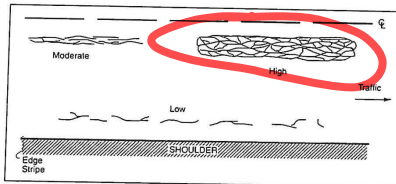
Distress Type ACP 1—Fatigue Cracking
